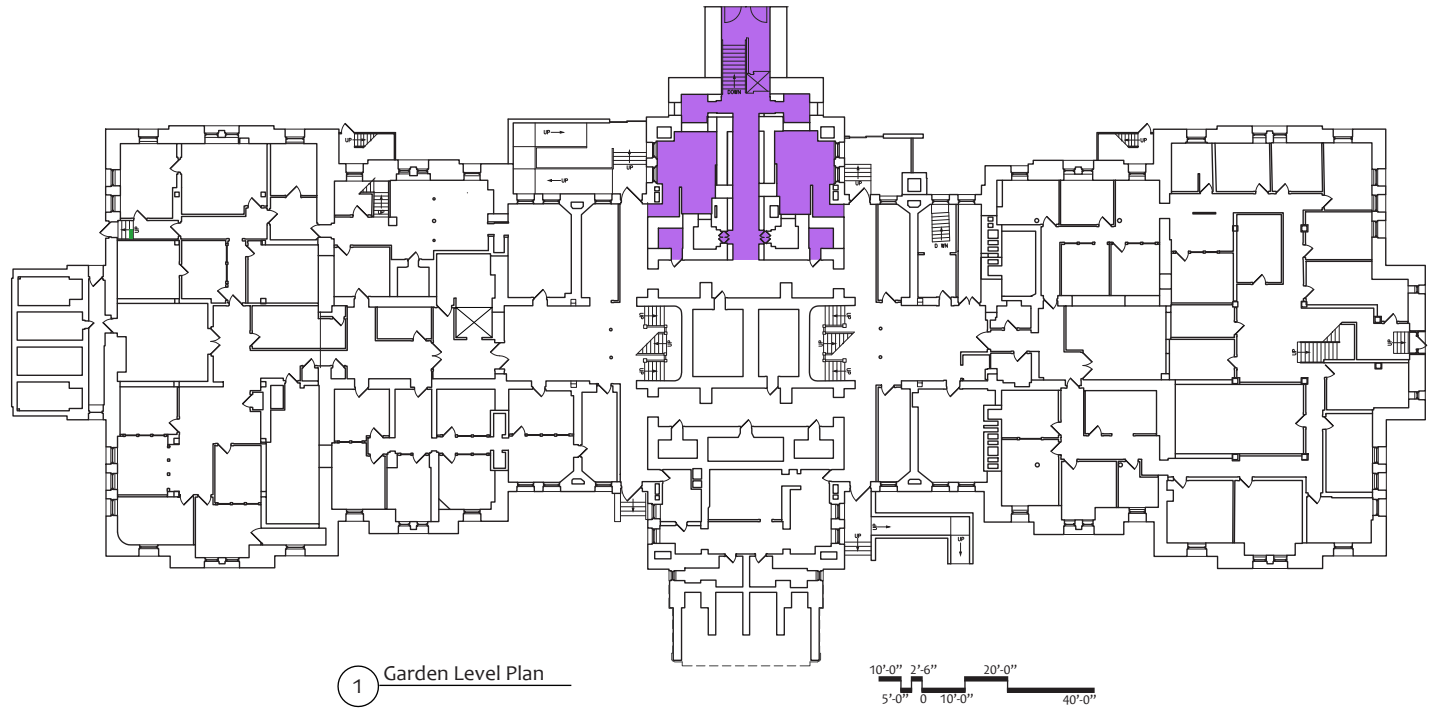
Garden Level Plan [Connection to the Connector to the Herschler Building highlighted in purple]
